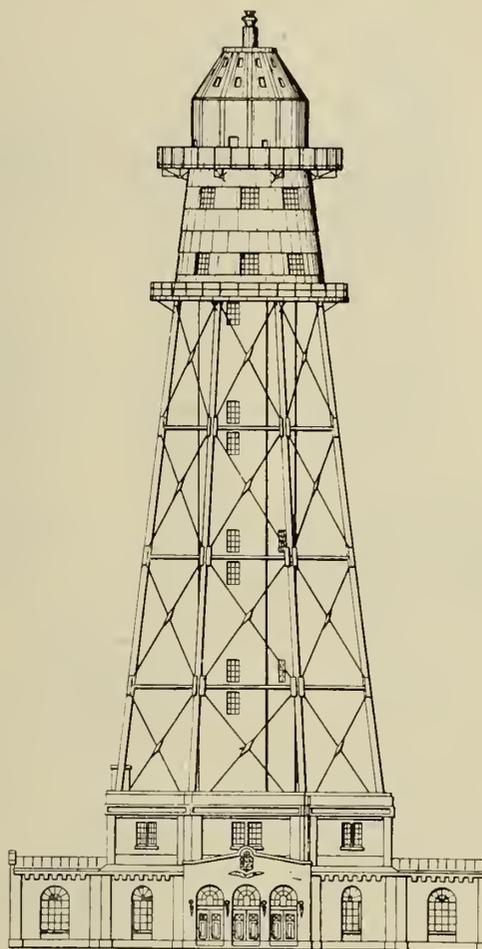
Elevation of Mooring Tower, Montreal Air Harbour at St. Hubert, P.Q.
